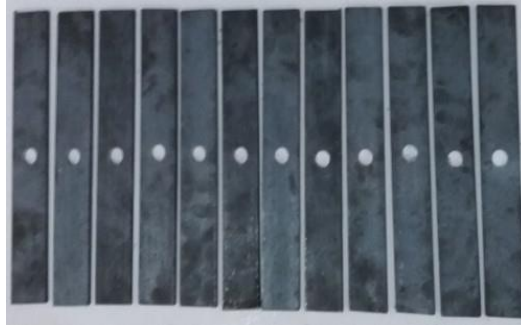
Failure mode of plane specimens non-strengthened plates without CSH
